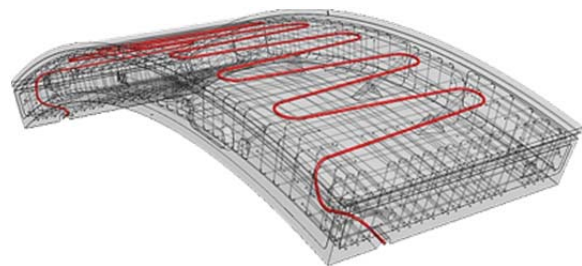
Absorber tubes inside a tubing (Ed. Züblin AG)
